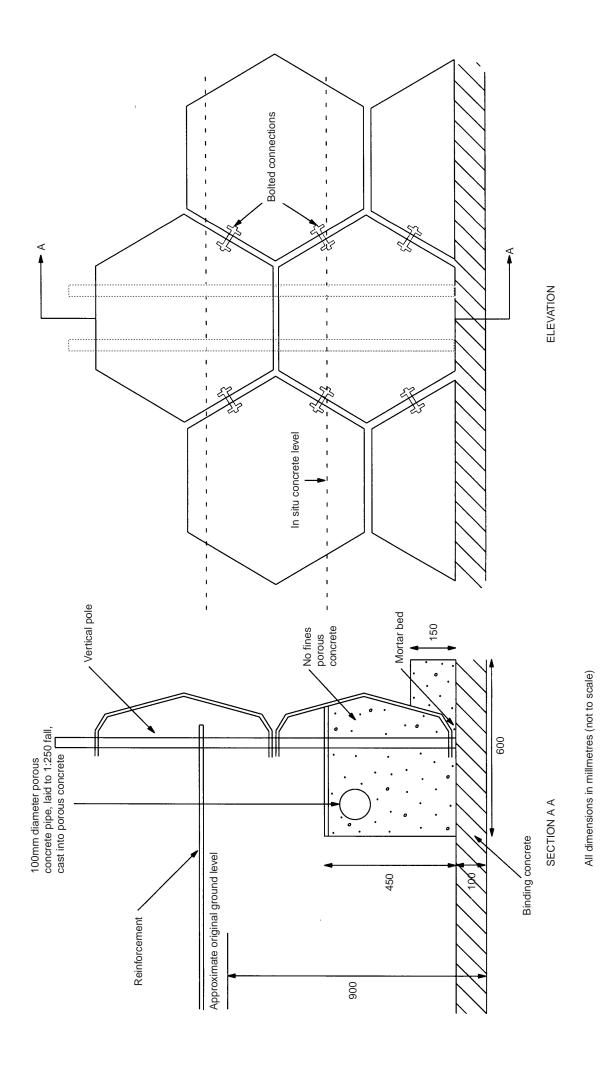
Details of construction arrangement at the foundation of the wall at Whitley Bridge
